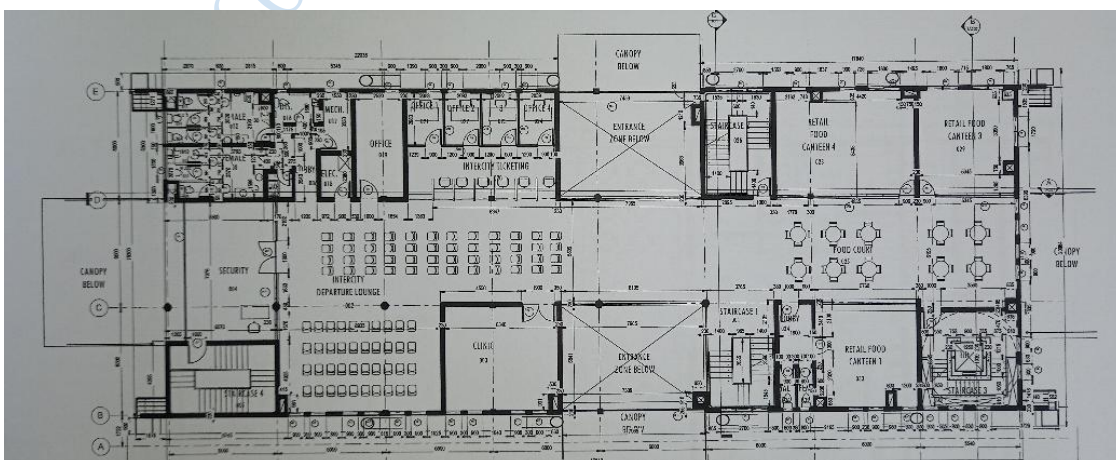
First Floor plan of the Modern Bus Terminal at Ojoo in Ibadan.
